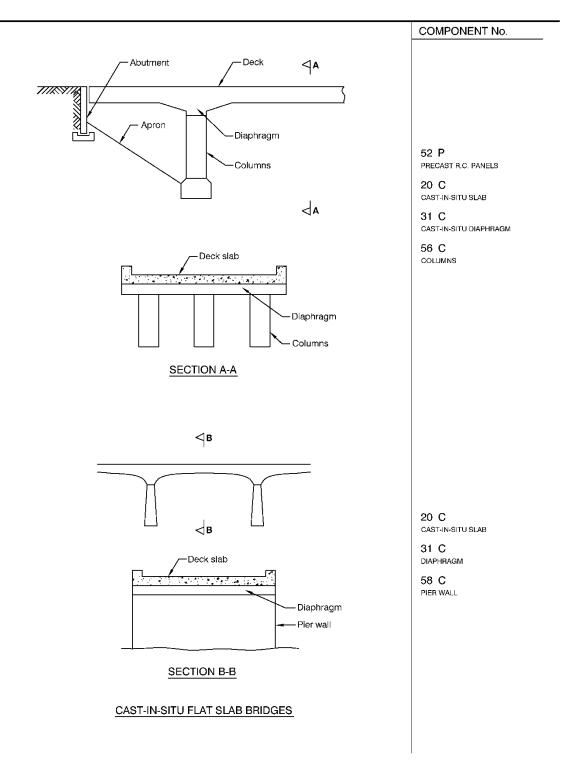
DECKS/SLABS & STEEL DECKING. SHEET 2 of 2
